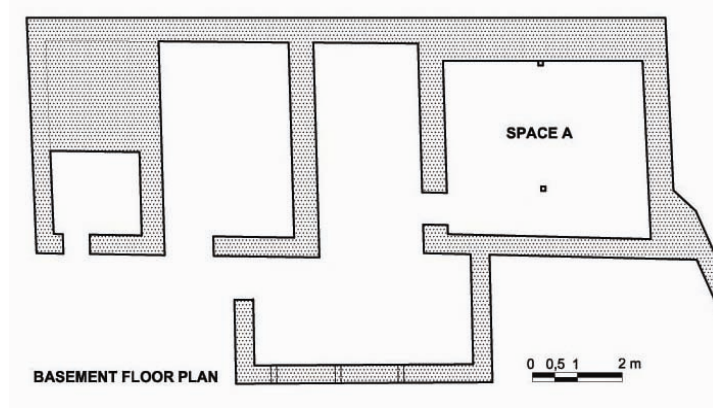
Basement floor plan of house in Şeyh Cami St. No: 32
